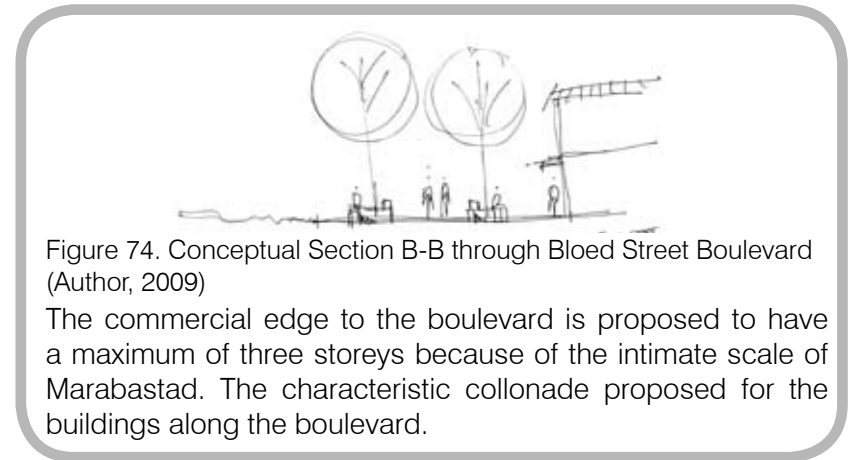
Conceptual Section B-B through Bloed Street Boulevard (Author, 2009)
